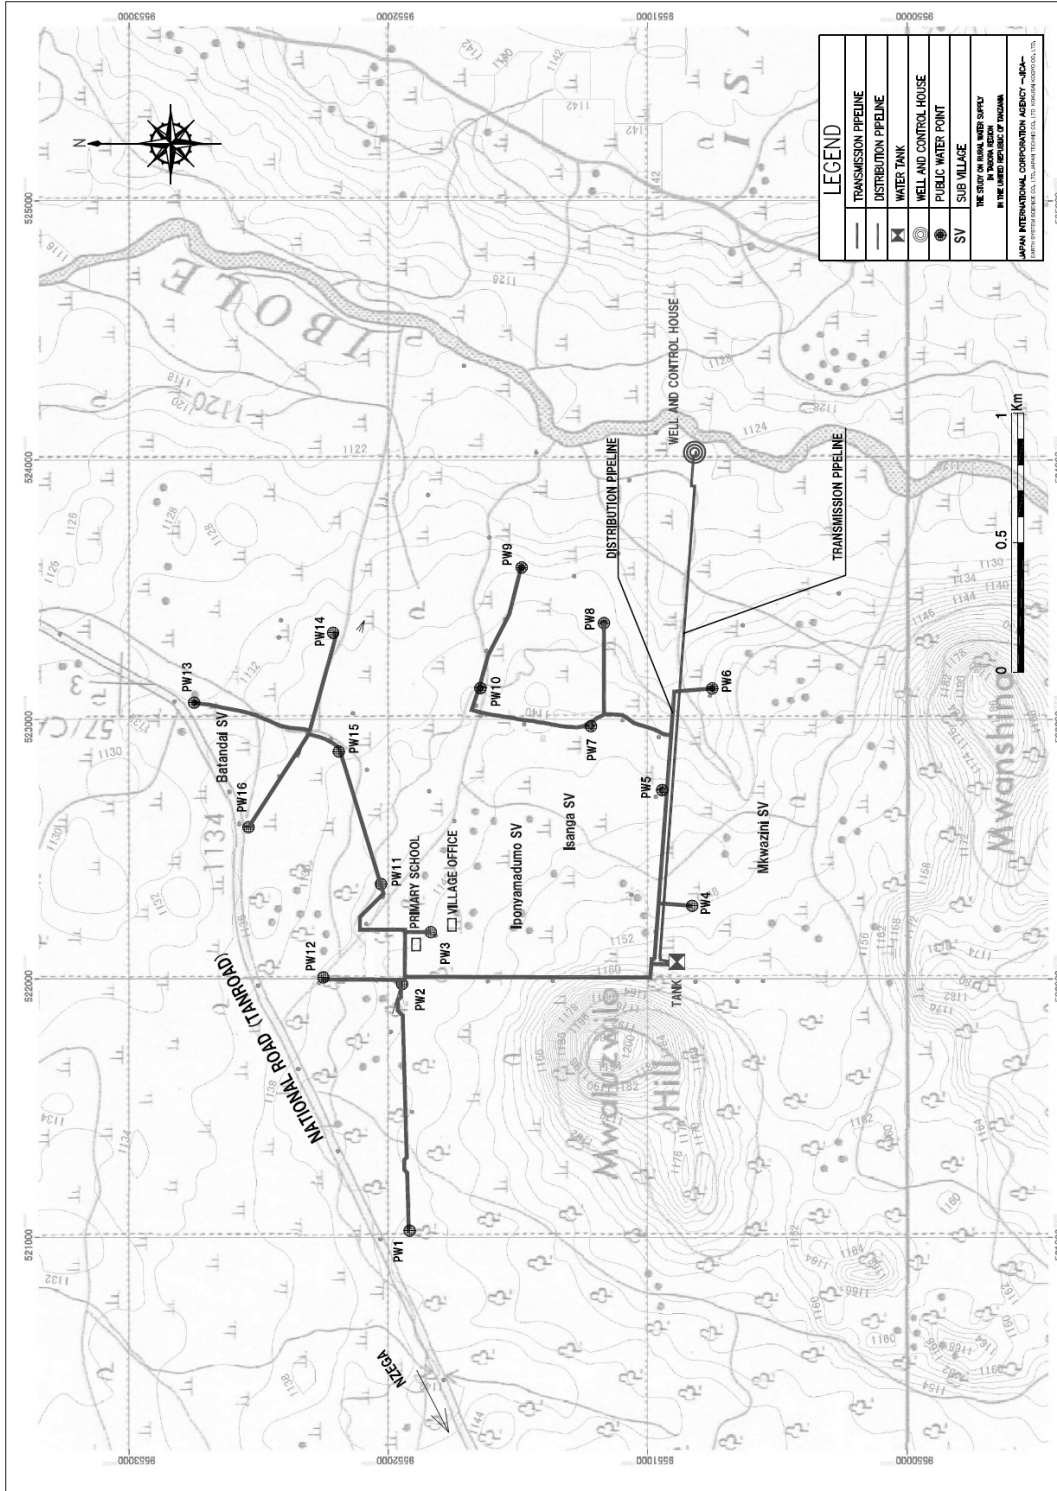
Layout Plan of Isanga Village, Nzego District
